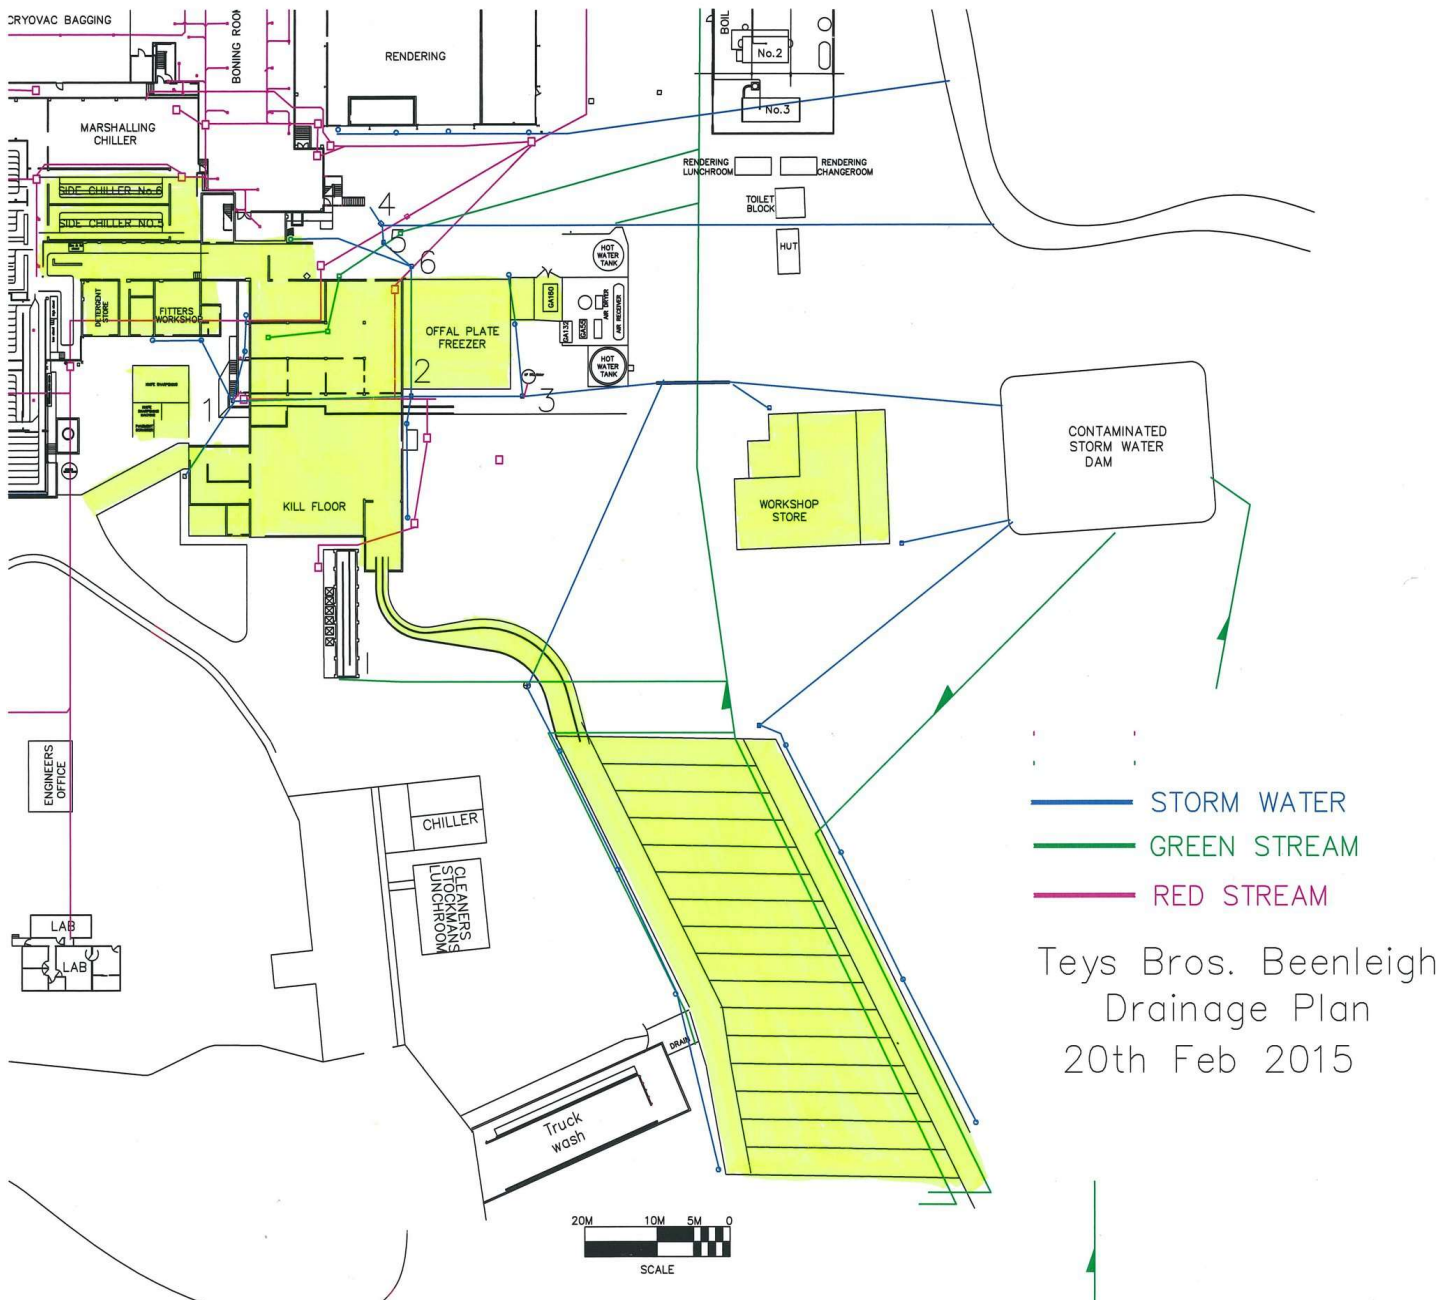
Updated Stormwater Drainage Map. Highlighted areas identify roofed structures that direct stormwater to the contaminated stormwater pond.
